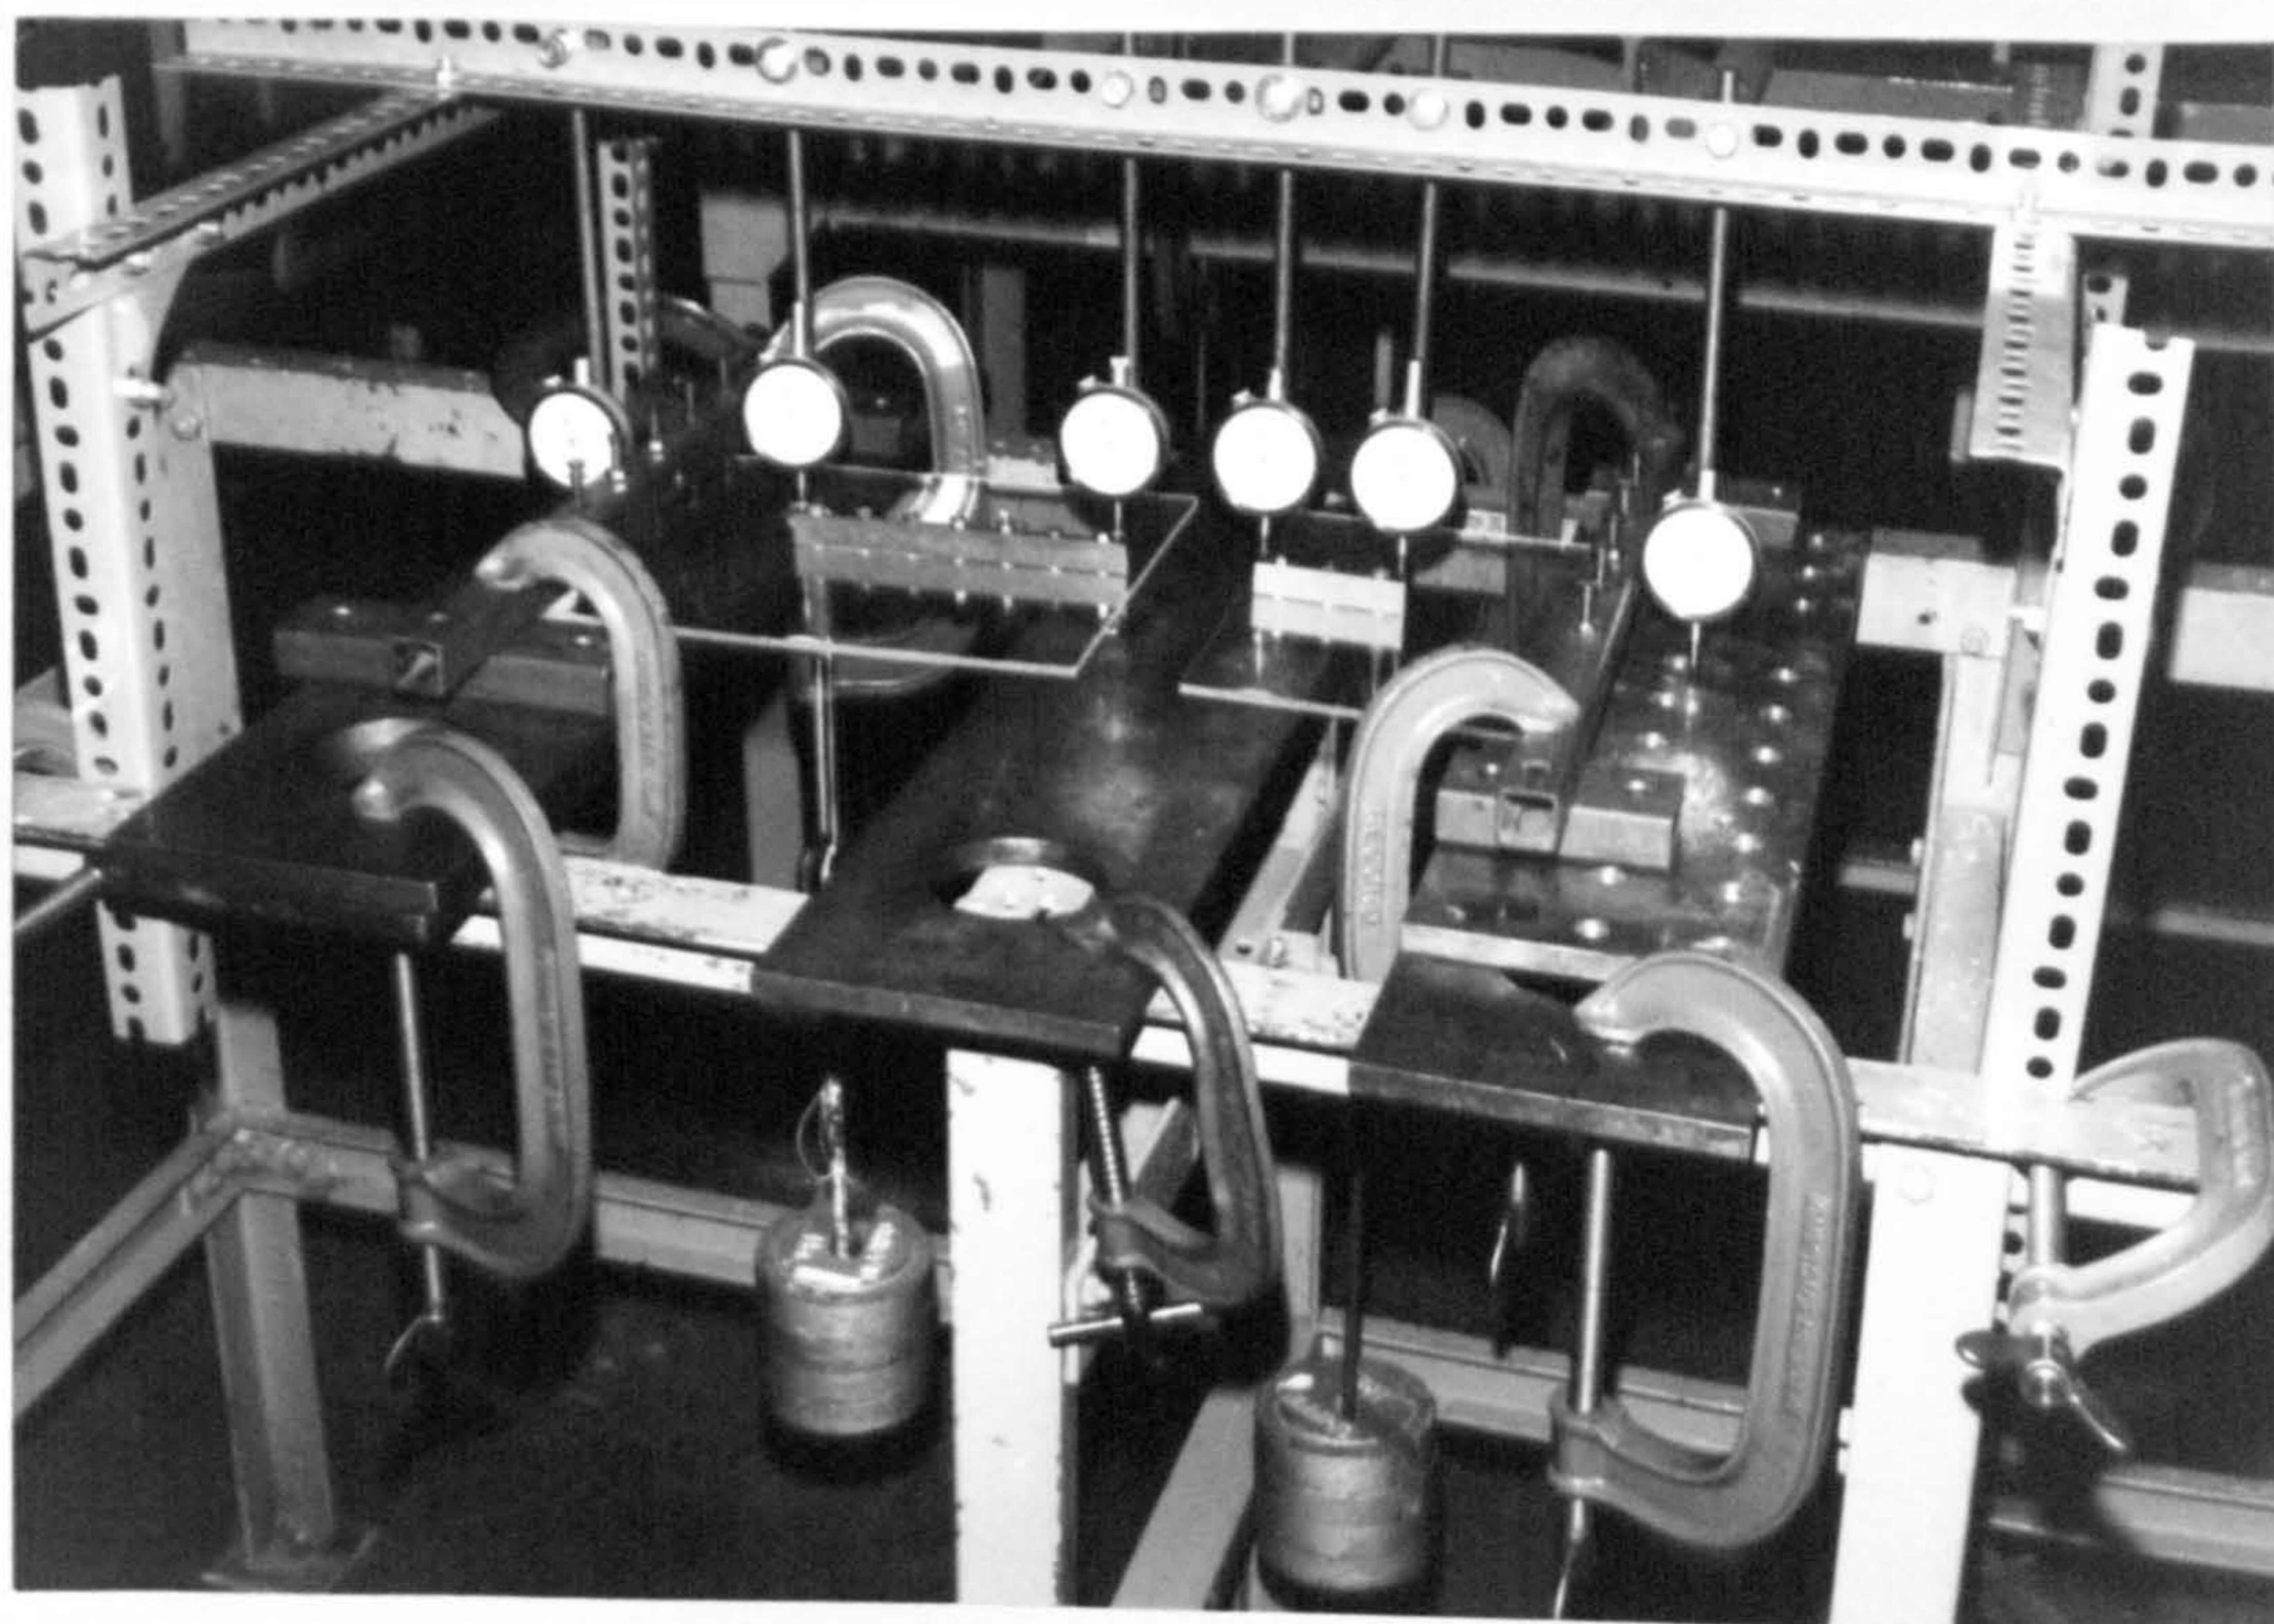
(b) Pair of Plane Wall-Slab Models Under Test
